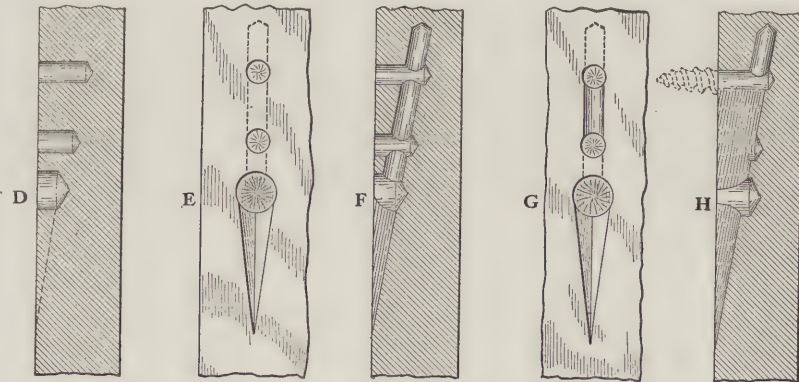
LAVATORY BACK ANCHORS FOR SECRET FASTENING—PROCESS OF CUTTING
